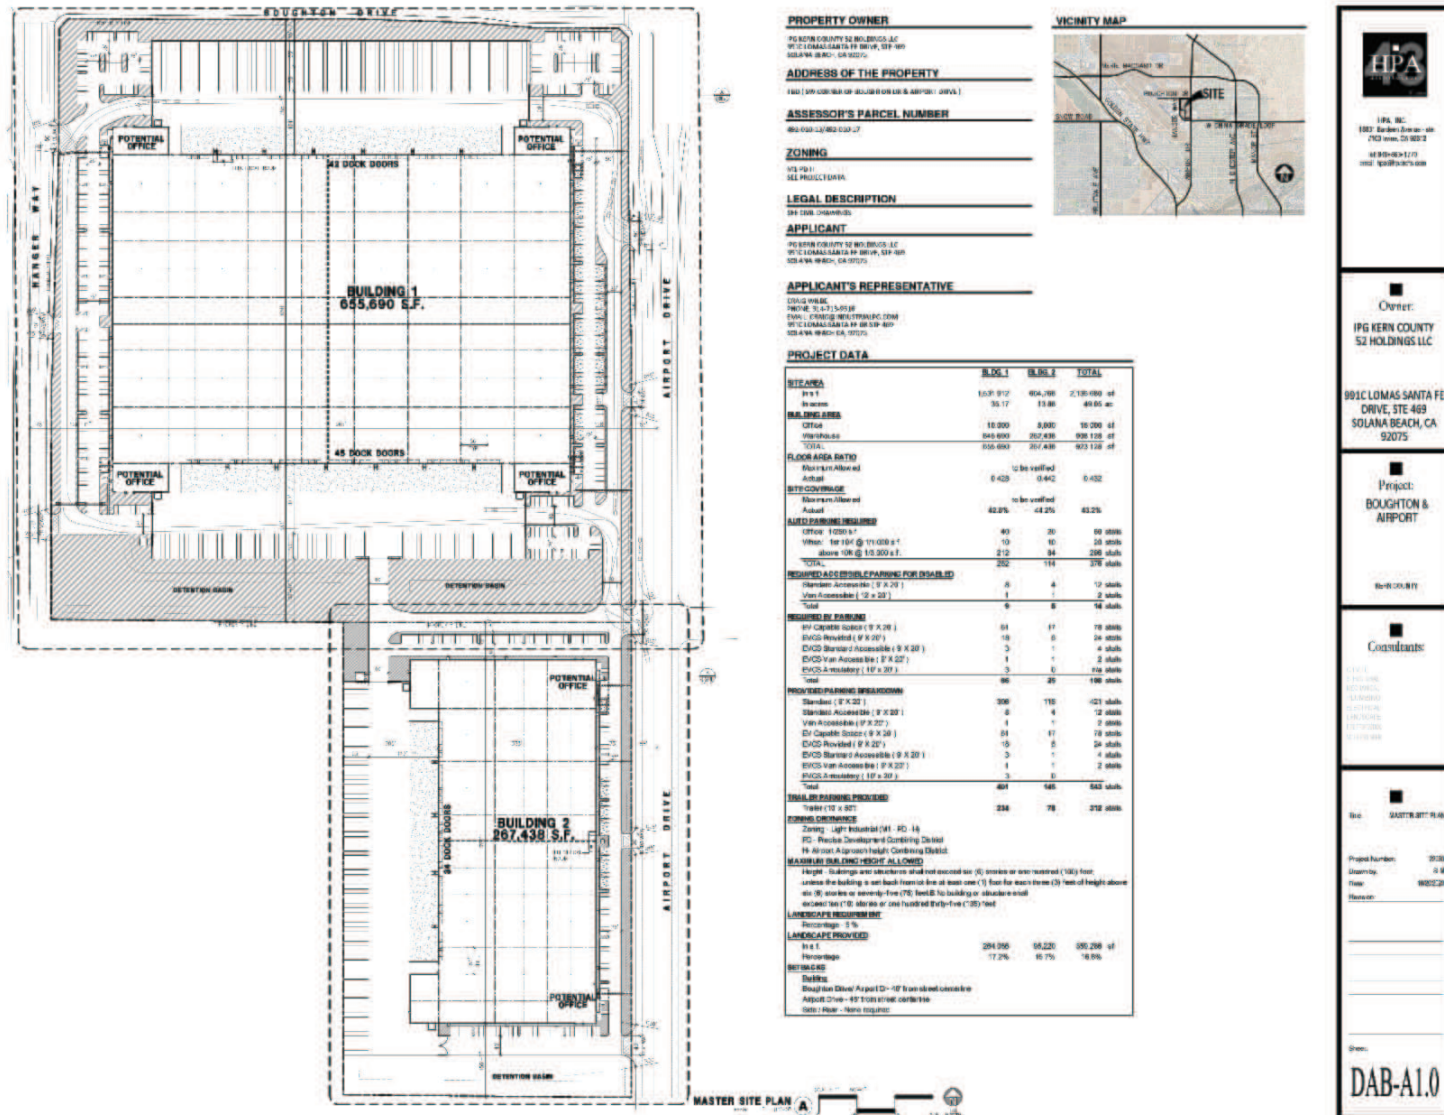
Precise Development Plan - Building 1 Site Plan
